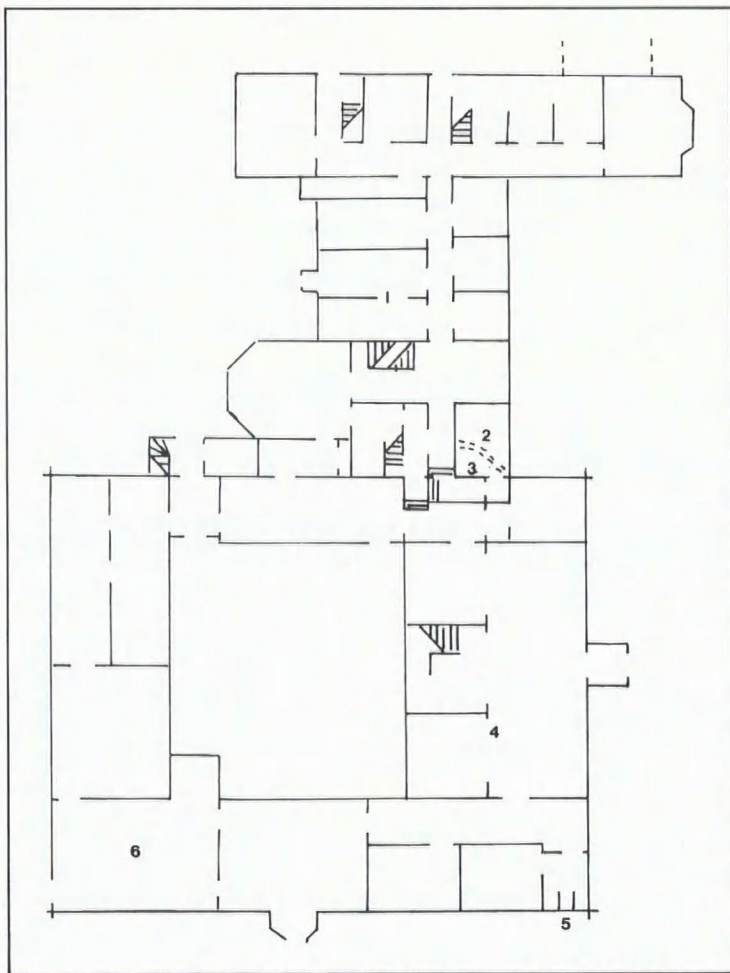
Sketch-plan of the Ground Floor of the house showing: 1 Cistern and remains of old walls under present floor; 2 Conduit; 3 Blocked-up doorway; 4 Remains of older ceiling under floorboards above; 5 Blocked-up window (first left of stairway on Buck print of 1730); 6 Study
